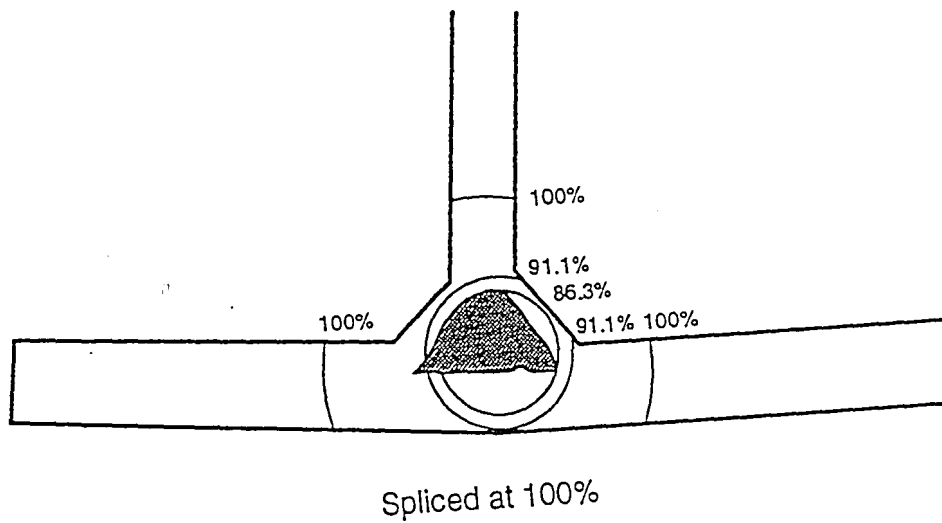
Penny Shaped Crack Growth From an Irregularly Shaped Hydrogen Related Crack in a Transverse Groove Weld Showing Crack Fronts As a Percentage of Total Fatigue Life.
